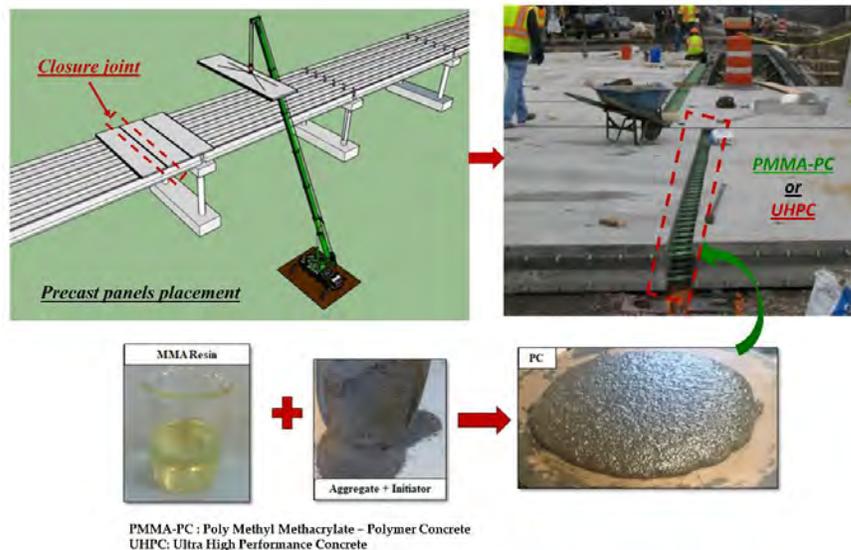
Graphical abstract for the proposed polymer concrete for bridge deck closure joints.
